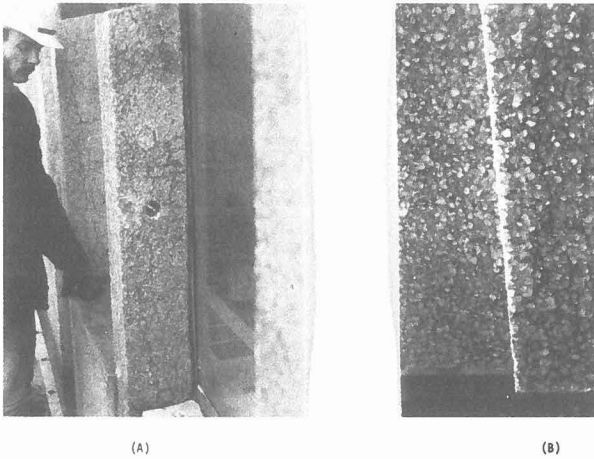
Cracks seen on the precast cladding panels of Building #3. A small core was obtained from the panel shown in (A) for laboratory examination.
